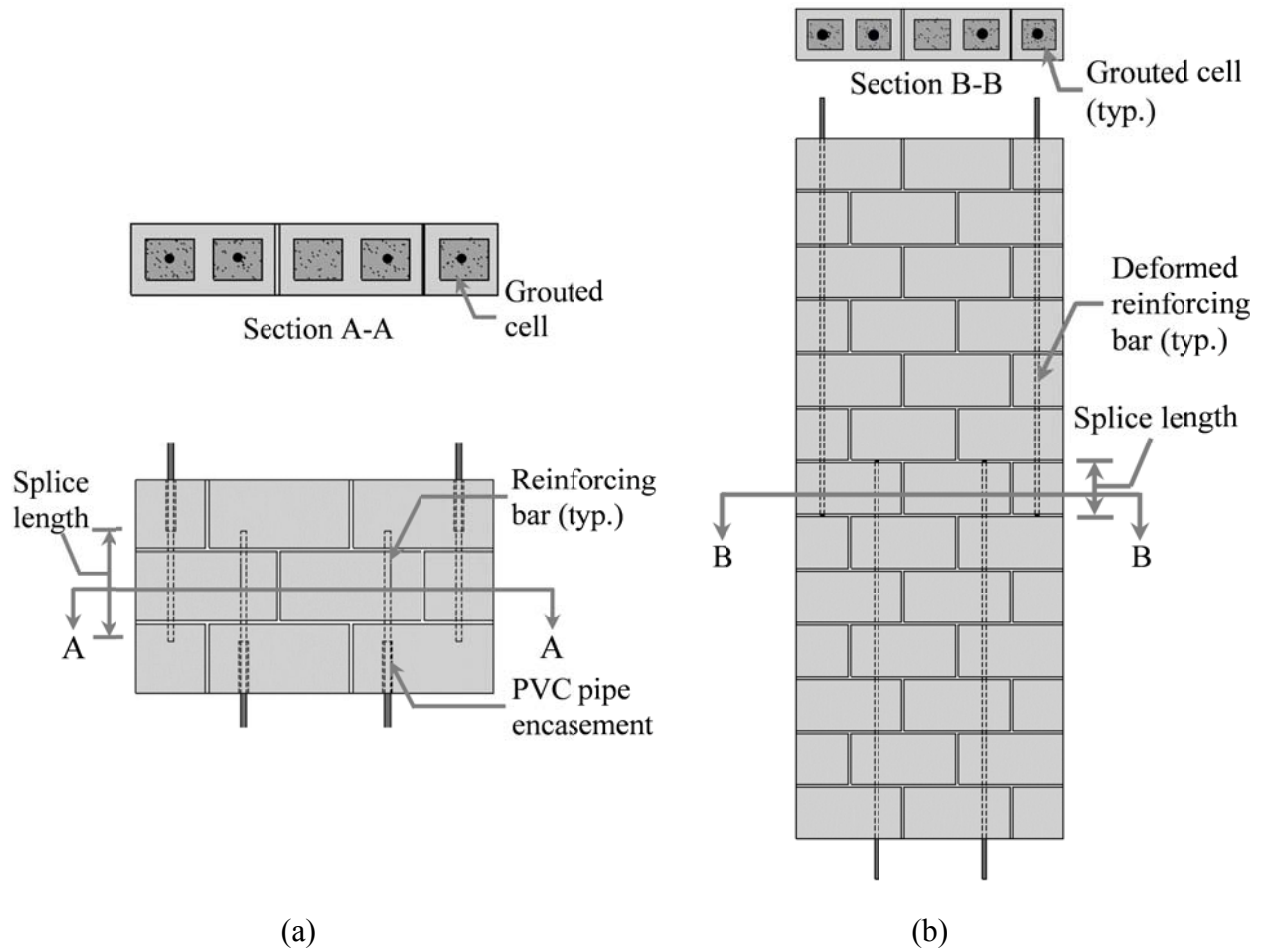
Non-Contact Lap Splice Geometry (Ahmed & Feldman, 2012): (a) Double Pullout Specimen, and (b) Wall Splice Specimen.
